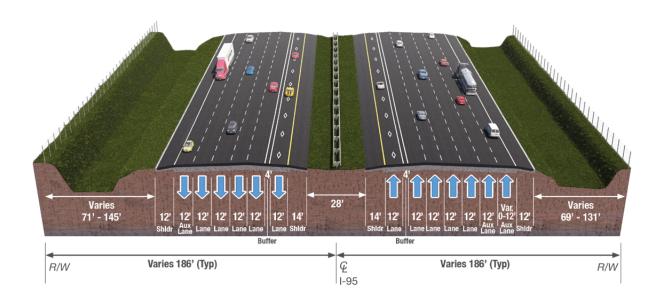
Typical Section – I-95 South of Central Boulevard (Mainline Alternative 2)
